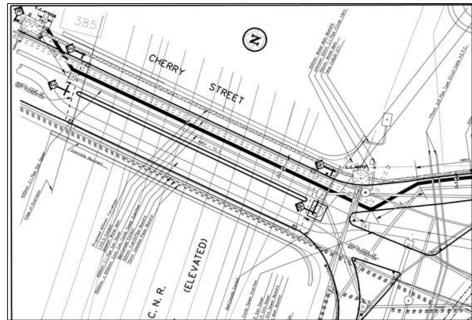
Cross-Sections and Plan provided to City by Toronto Hydro (May 2013) showing Proposed 4W5H Electrical Duct along Cherry Street
